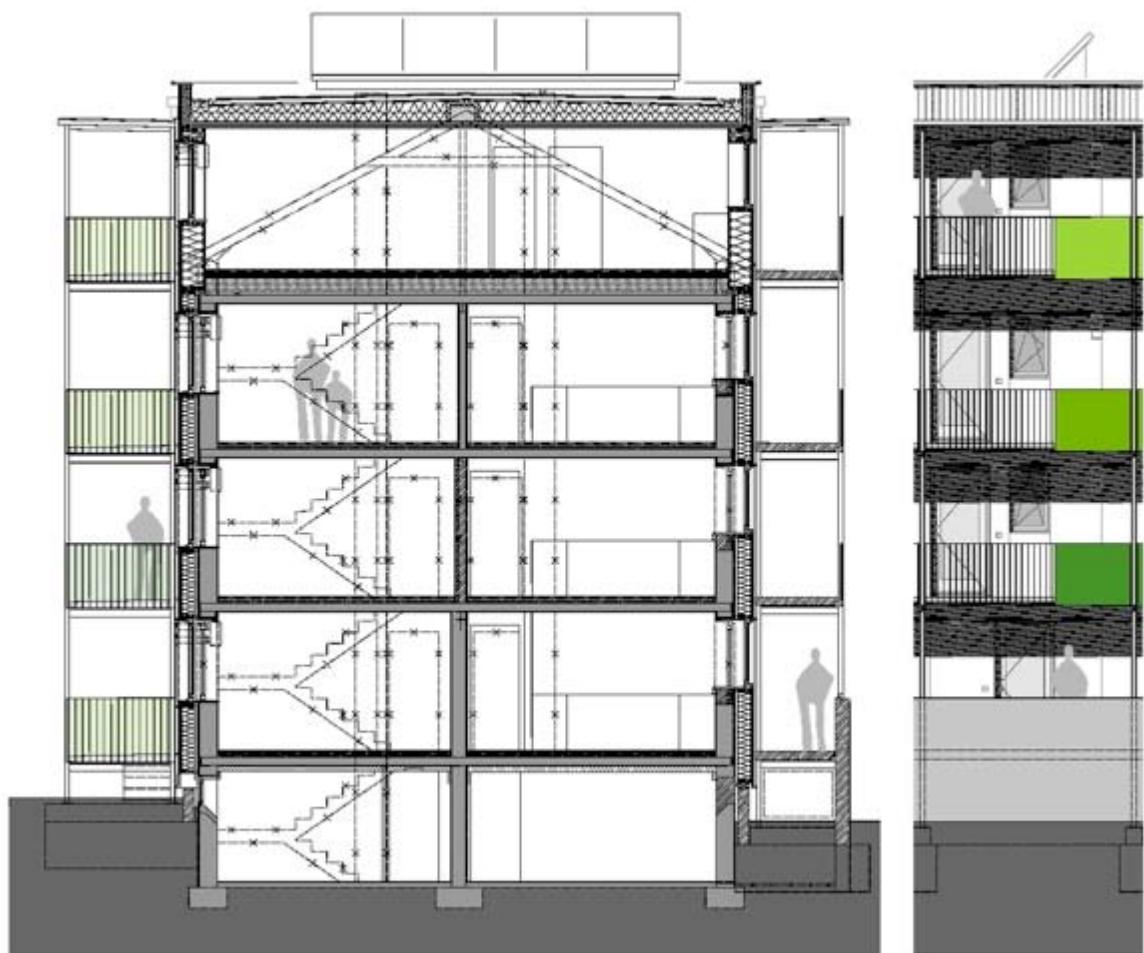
Total cross section and partial elevation East with access galleries/ balconies
